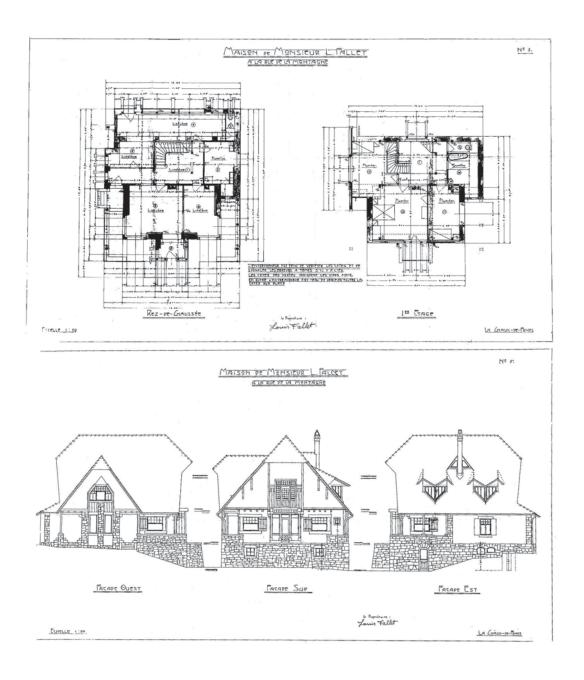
Jeanneret. Villa Fallet. Plan, 1906. FIG. 10 Jeanneret. Villa Fallet. West, south and east elevations, 1906.
